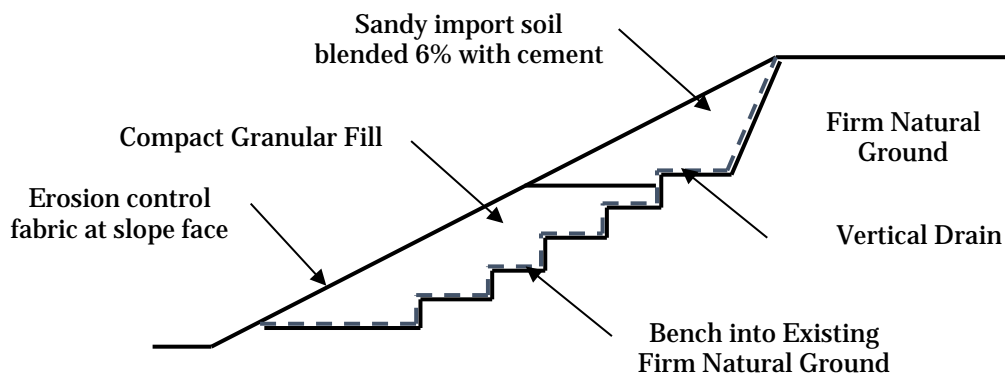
Soil cement repair of shallow slope failure (Day, R. W. 1996)
